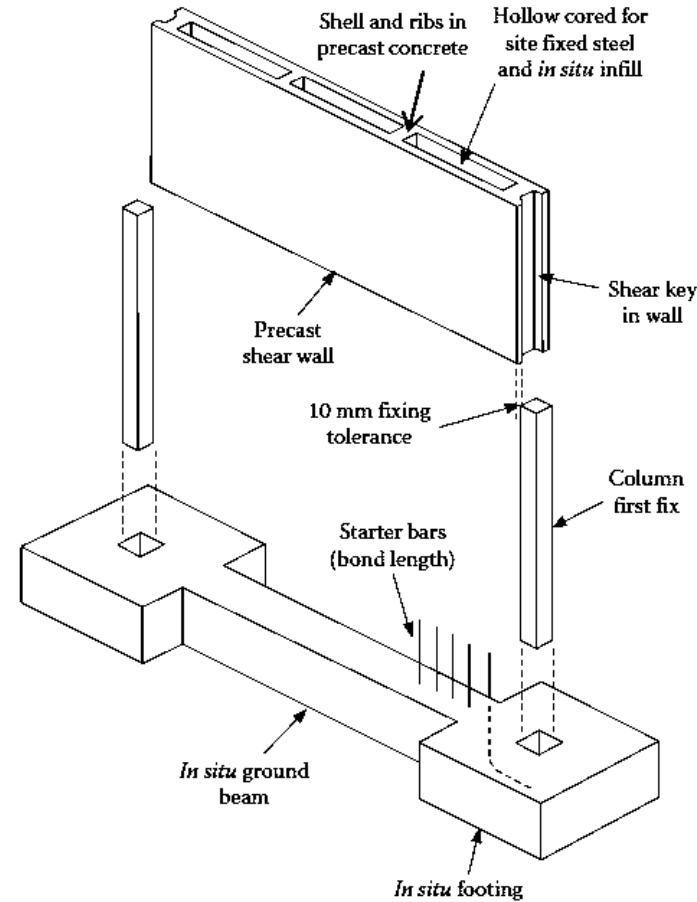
Precast hollow-core walls designed as vertical cantilevers (note these are not the same as slip-formed hollow-core units used as vertical cantilever walls).
